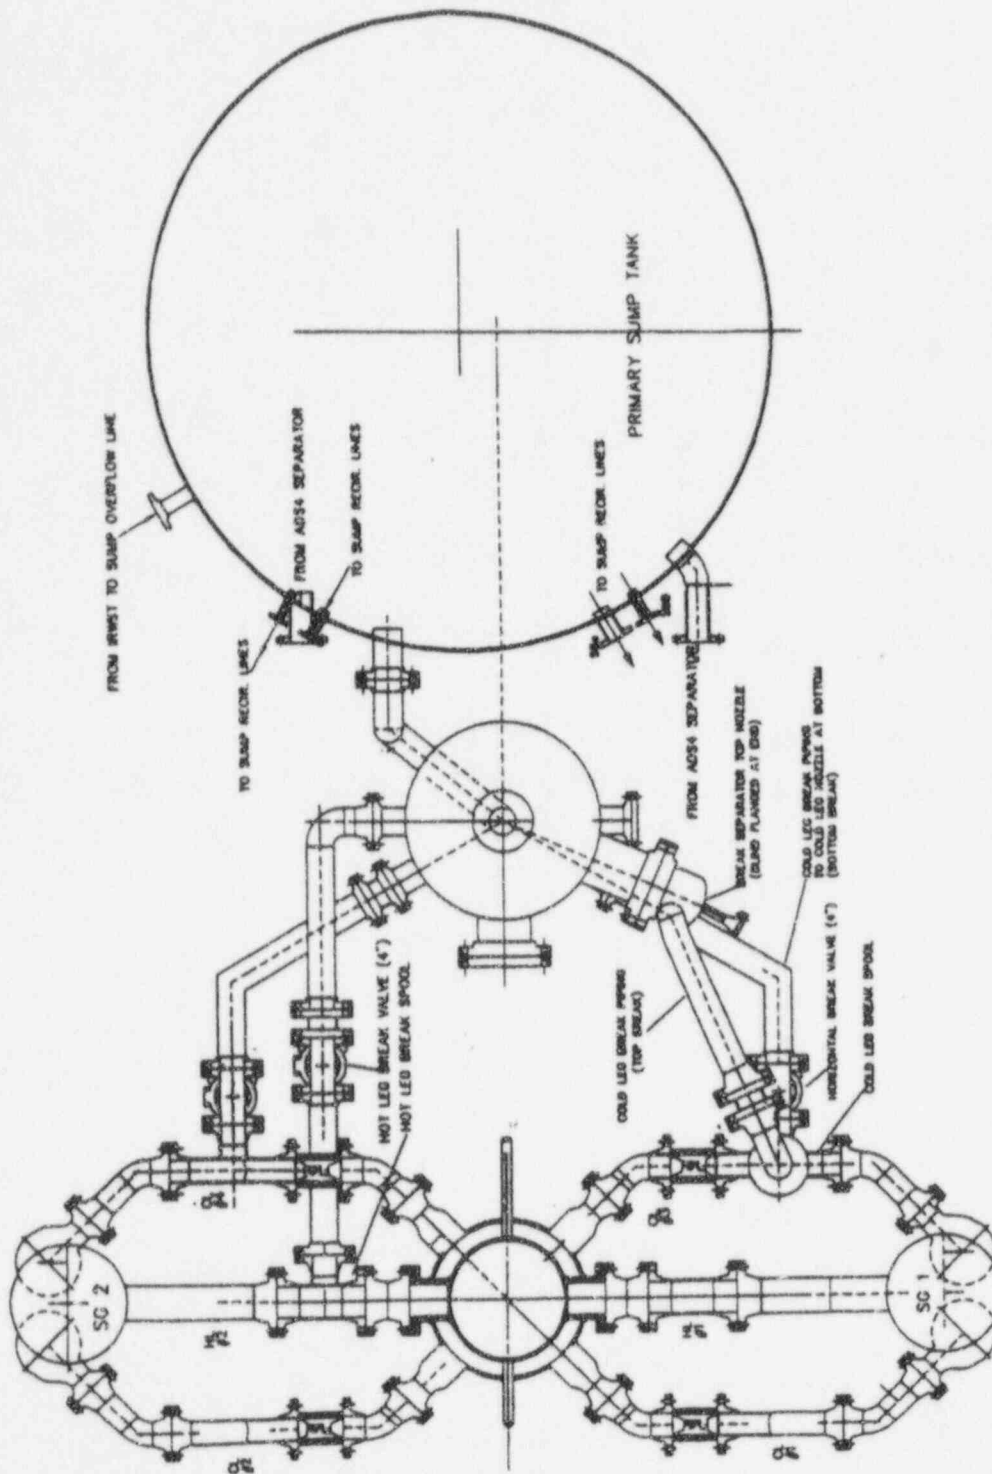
Primary Loop and Break Piping Layout (Sh. 1 of 2)
